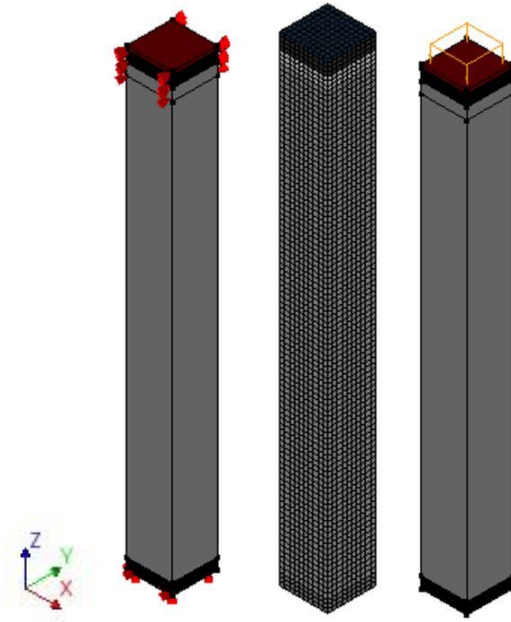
Designed bridge pier (a) boundary conditions, (b) concrete section mesh, (c) uniform stress as concentric loading
